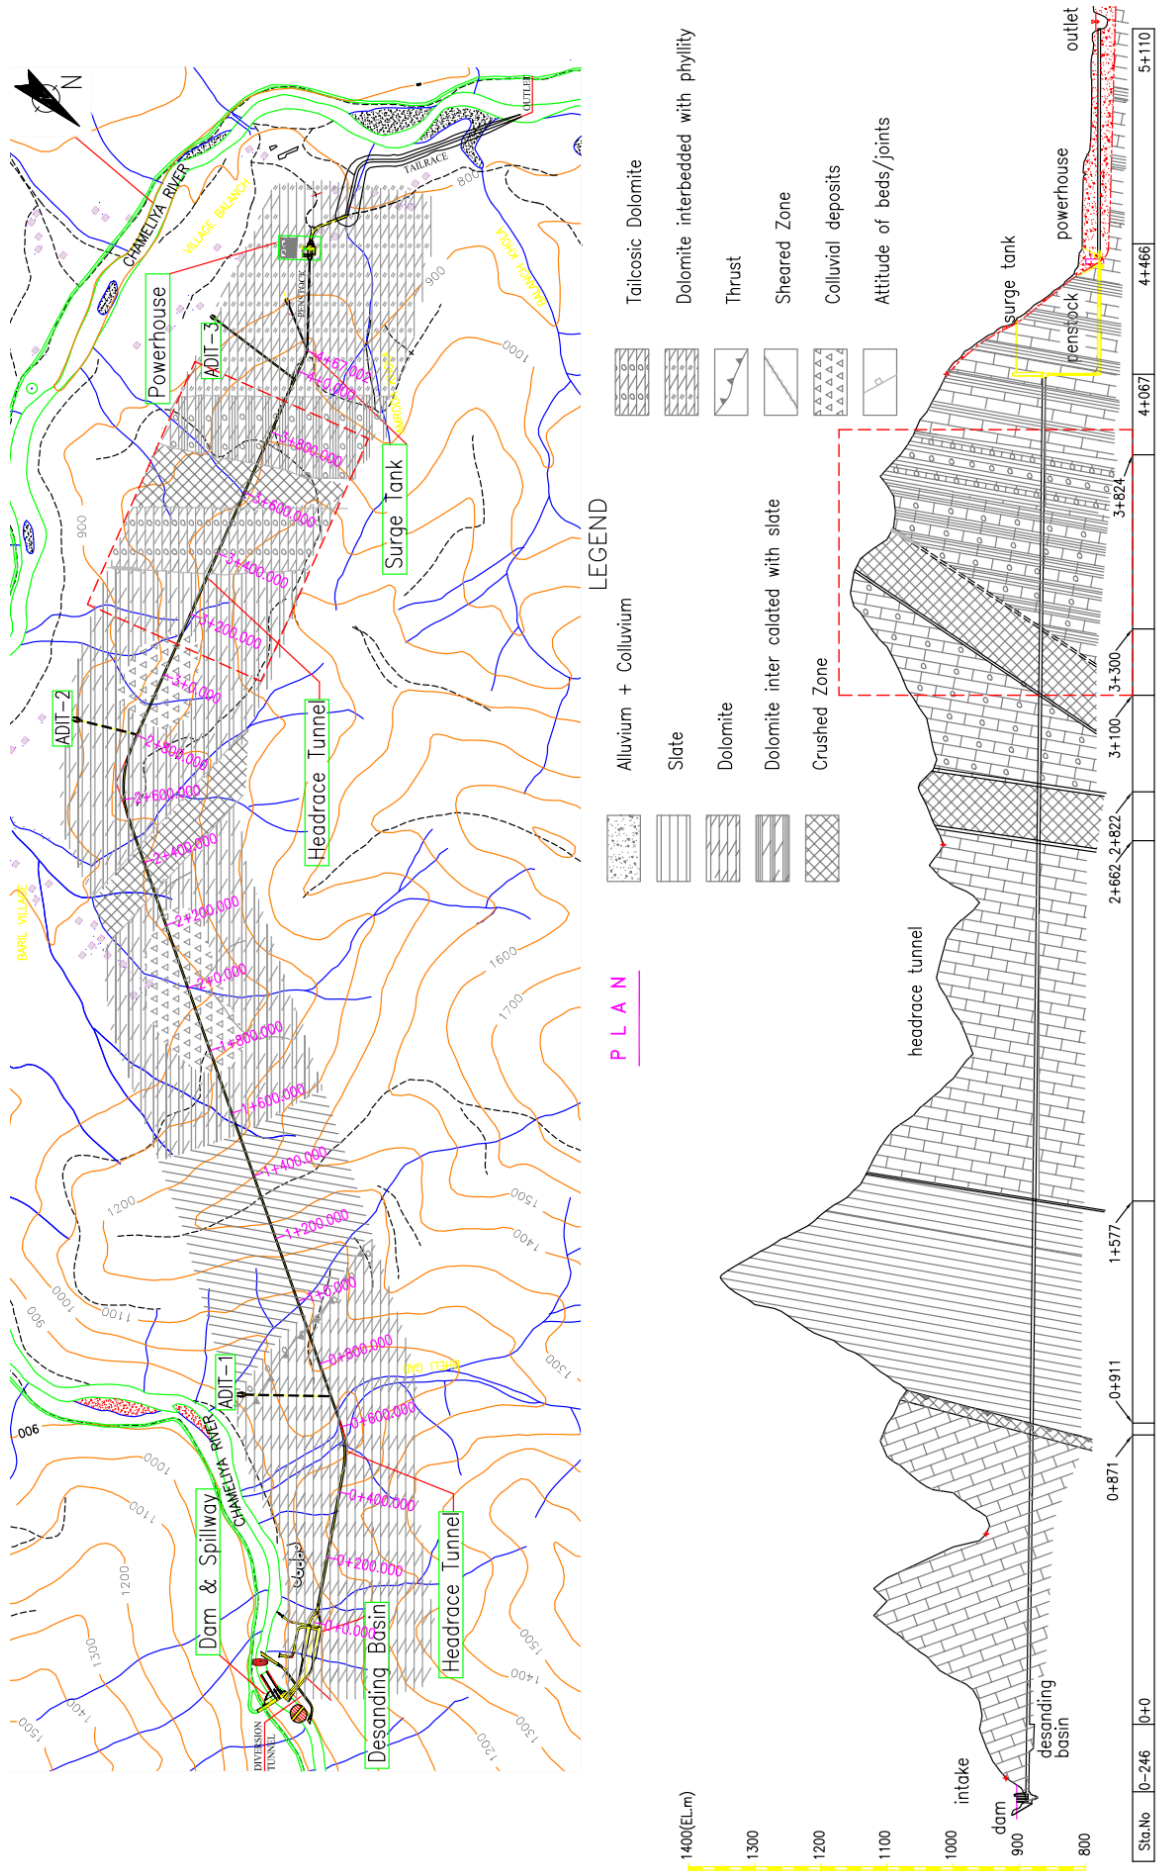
Geological Plan and Profile along headrace tunnel alignment of CHEP (Source: Latest information from CHEP site office, 2012)
